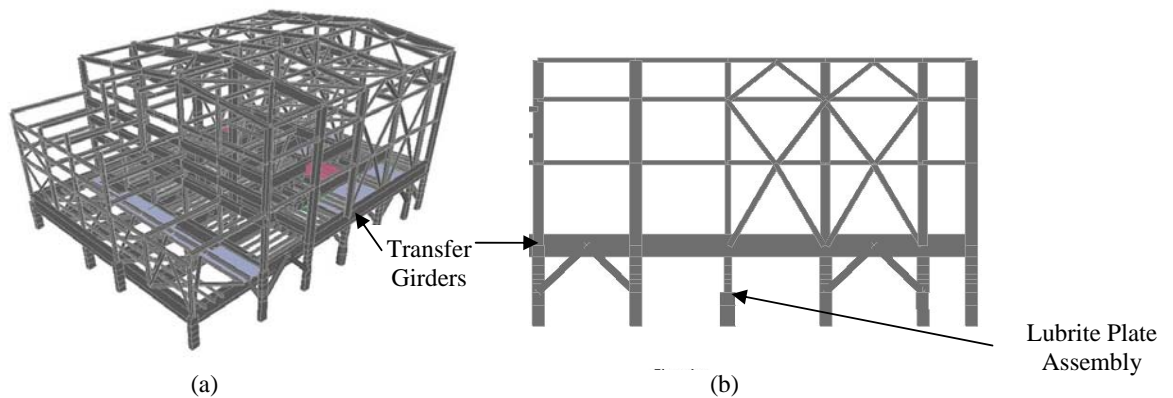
Schematic Diagram of a Typical Modular Structure (a) 3-D View, (b) Elevation View
